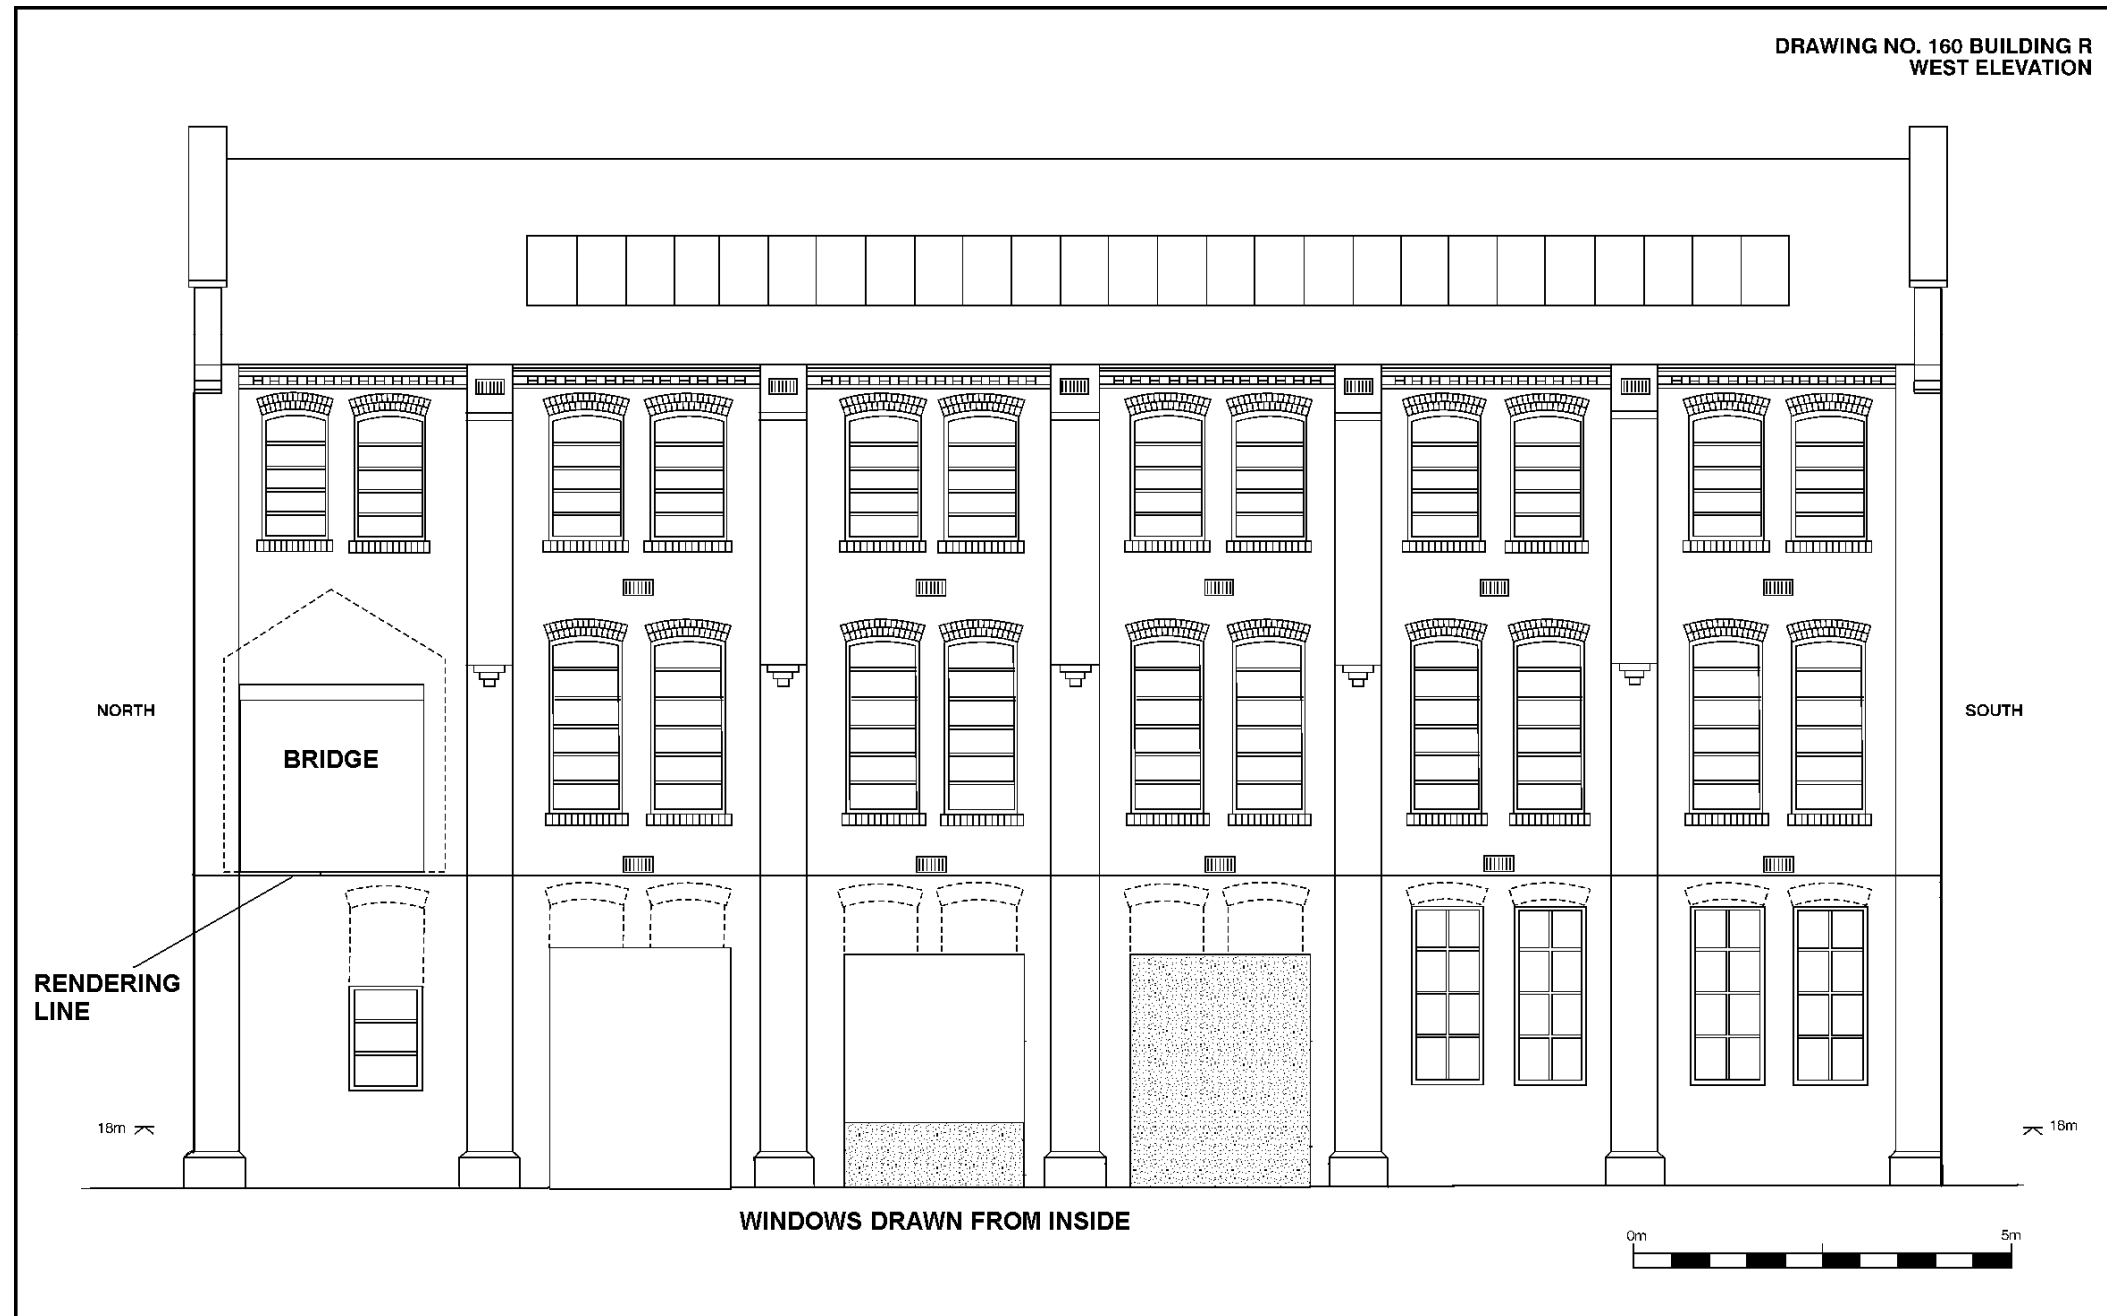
Survey drawing of the west elevation of Building R (scale 1:100)
